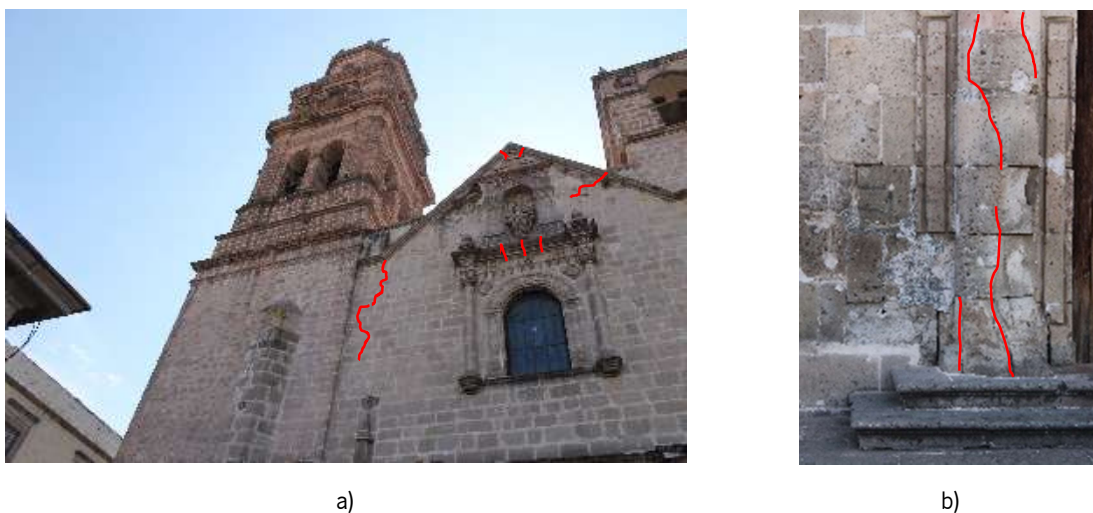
Damage in the west façade: a) cracks in the connection tower-façade and at the decorative elements; b) cracks in the frame door, exfoliation at the base of the pilaster and marks of previous interventions.
